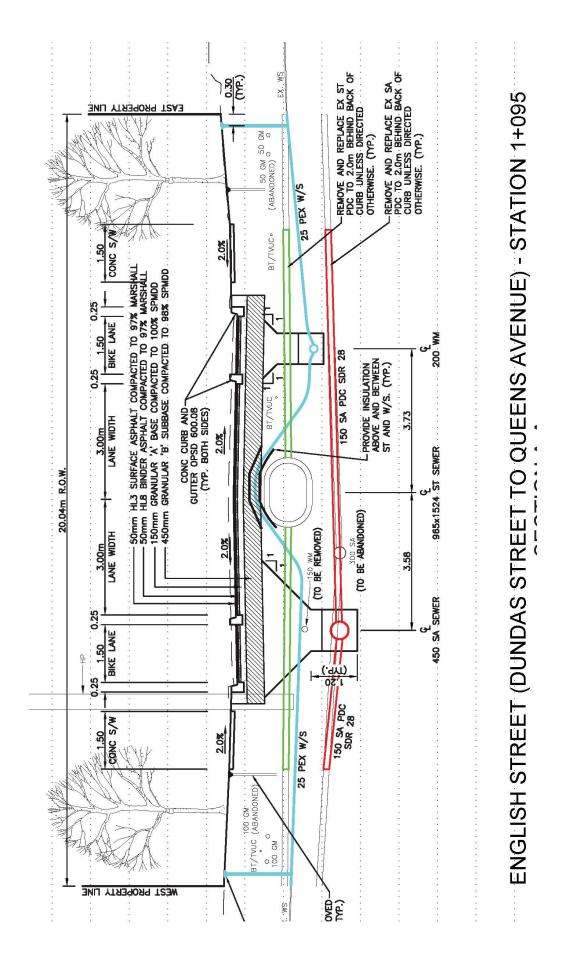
Cross-section of English Street Infrastructure Renewal Project for English Street between Dundas Street and Queens Avenue.
